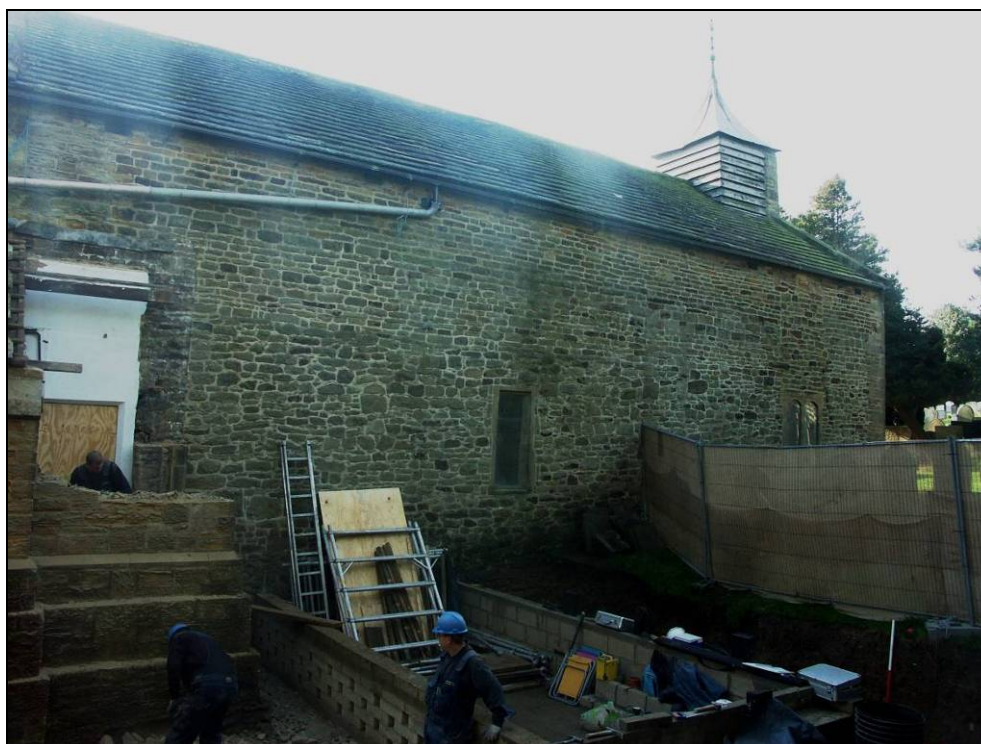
Partial demolition work of the vestry and view of the adjoining church wall, looking south-west.
